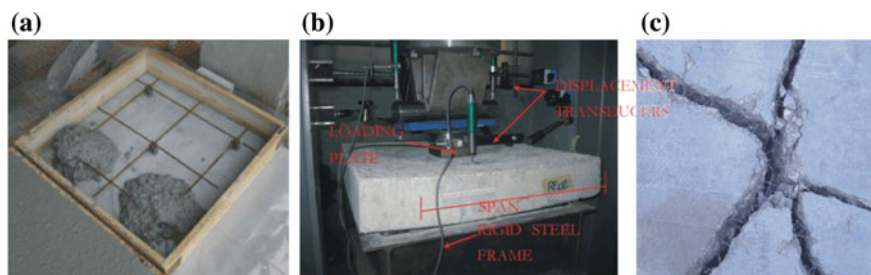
Slab-panel tests according to the EFNARC recommendations (1996) for assessing the potentialities of RSF for tunnelling applications: a panels reinforced with conventional steel grid mesh, b test setup and c RSF bridging the formed macro-cracks (Micelli et al. 2015)
